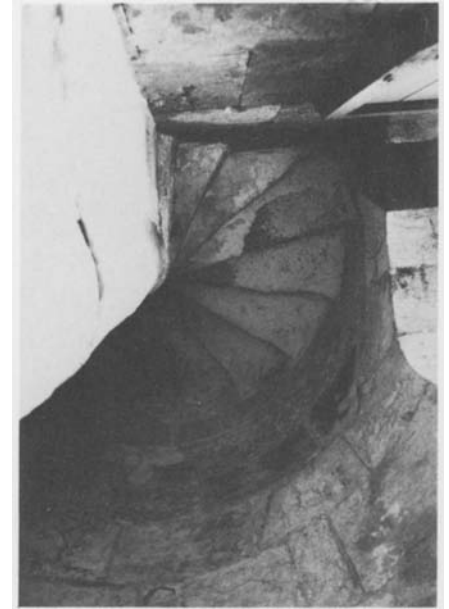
Ceiling of minaret staircase, with entrance door on right
